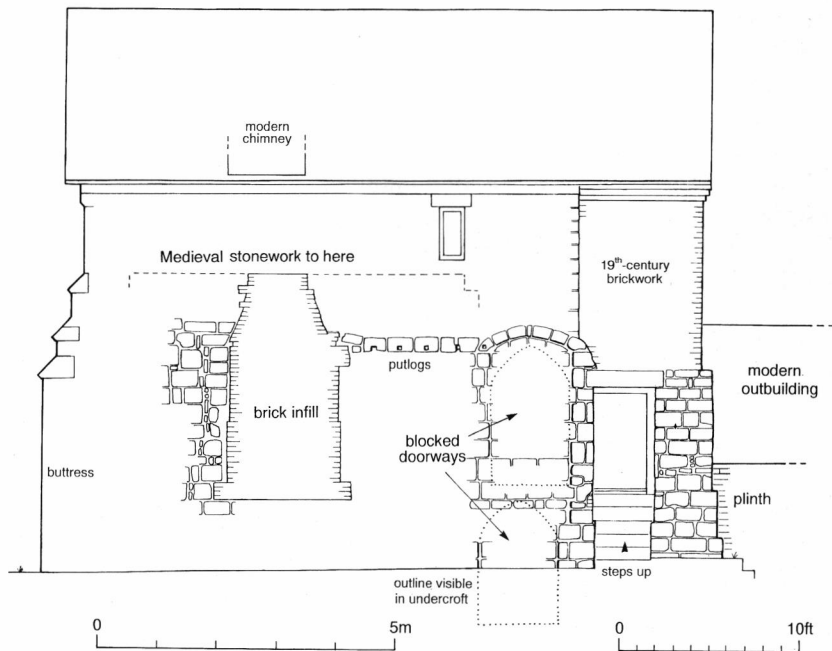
Breadsall Old Hall: eastern external elevation, incorporating infilled fireplace and blocked openings that once functioned as part of the western end of an earlier building; openings visible inside the building are shown in dotted outline; scale 1:125. *Drawn by R. Sheppard.
